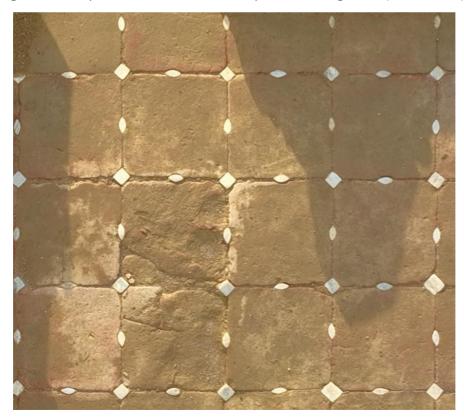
Detail view of the brick pavement decorated with opus sectile fragments (IAM archive)
